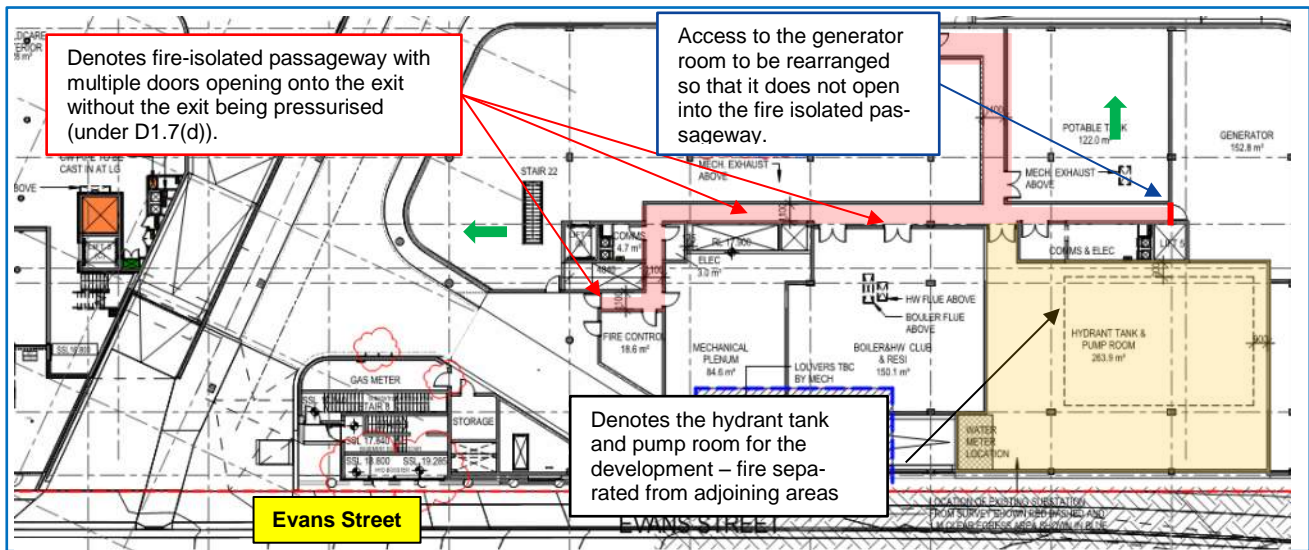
Fire-isolated passageway to pump room – multiple openings with no pressurisation
